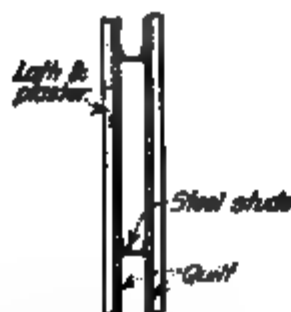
Partitions deadened with two layers of quilt-fireproof construction.
